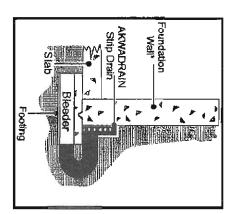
Install AMERDRAIN sheet drain 6" from the top of backfill to the base of the footer. Peel the fabric away from the bottom of the sheet (approximately 8"). Place the AKWADRAIN 6" strip drain next to the core of the sheet drain, dimples facing the core, and wrap the fabric around the strip drain and tuck to secure.
